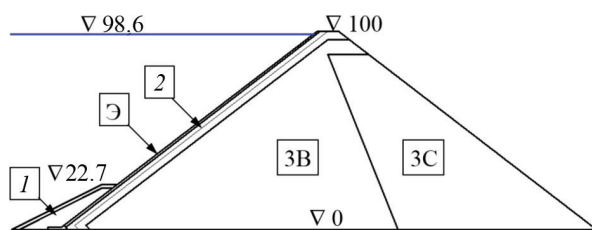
Structural diagram of concrete faced rockfill dam (CFRD): 1 — protection prism; 2 — under-face zone; 3B, 3C — shell zones; 3 — reinforced concrete face
